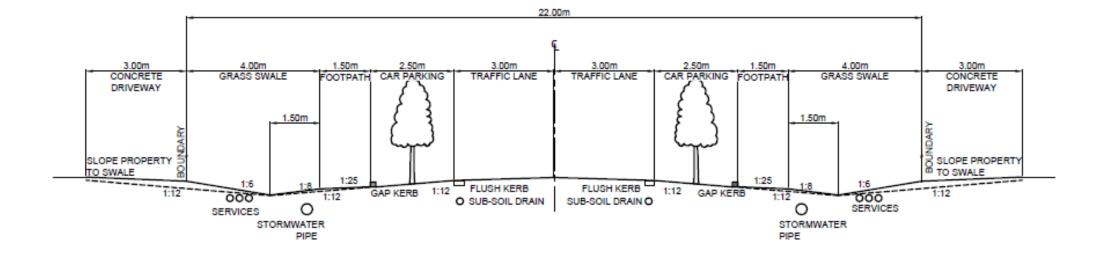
Te Kauwhata Structure Plan – Road cross sections – Local Roads
